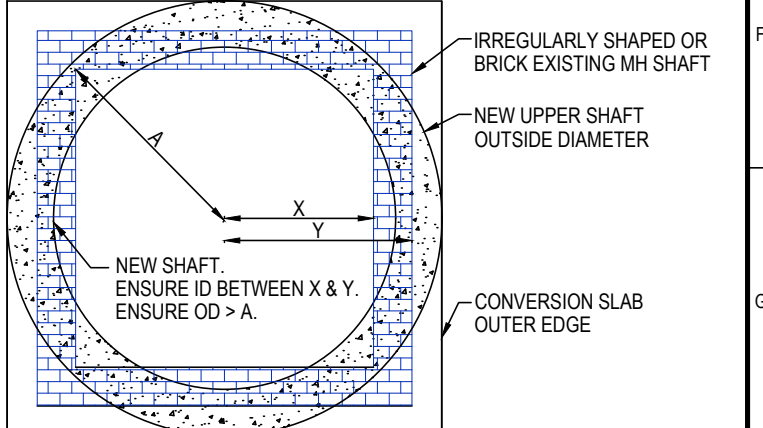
M: SECTION B: COMPONENT OUTLINES
